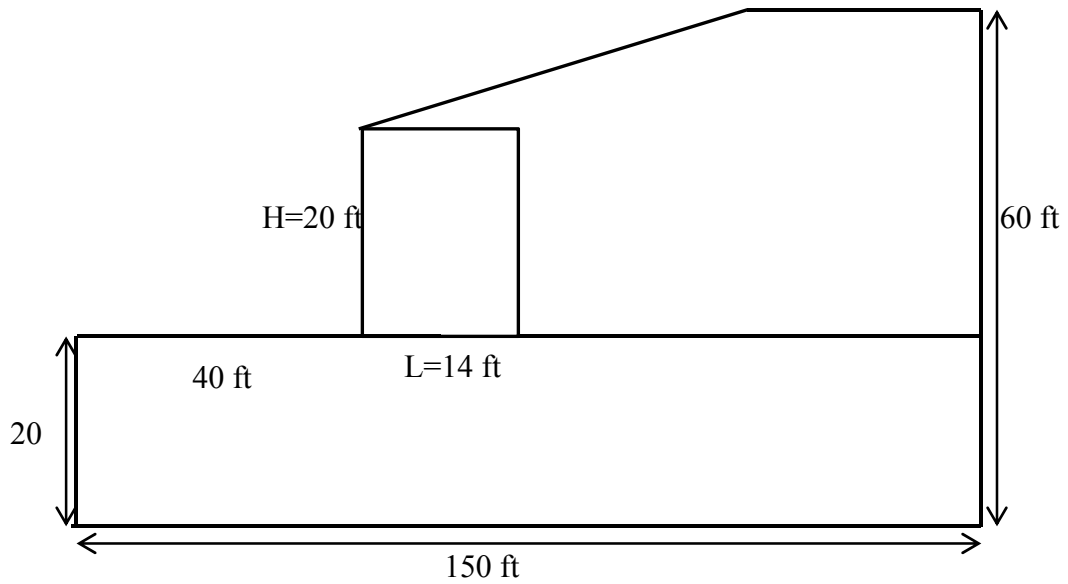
MSE Wall with 20 ft Wall and 3H:1V Back Slope.
